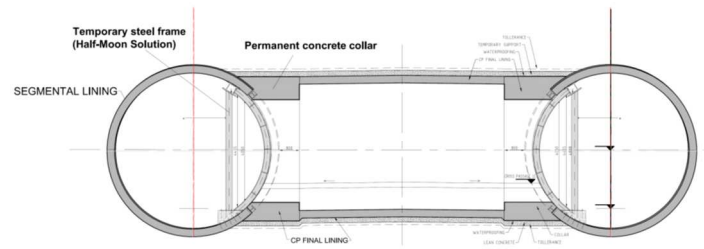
Longitudinal cross section of a typical cross passage constructed by proposed design solution
